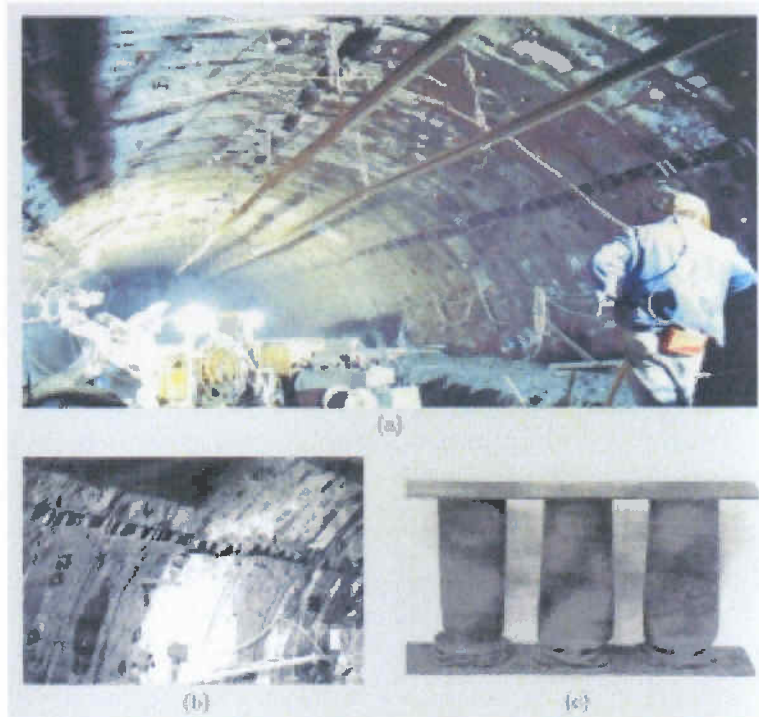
Semmering pilot tunnel: (a, b) shotcrete tunnel lining with Lining Stress Controllers (LSC) installed in longitudinal gaps and (c) prototype of LSC after buckling (15).
